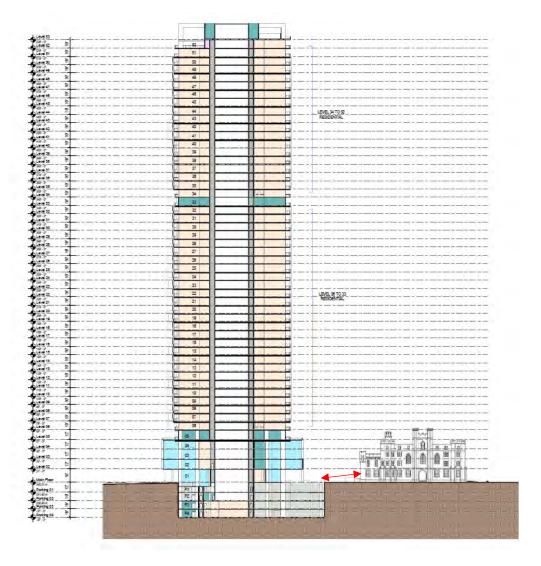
Cross-section view of front (east) elevation of the courthouse and development showing the distance between the parking garage and the adjacent historic building (Source: Zedd Architecture, 2022).
